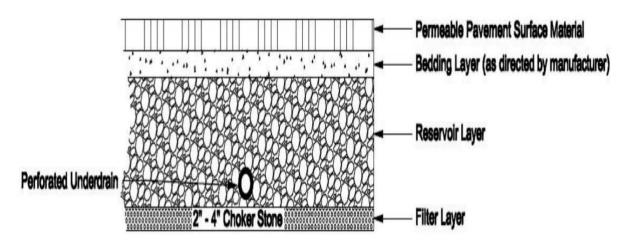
Example cross section of permeable pavement.<sup>395</sup>
